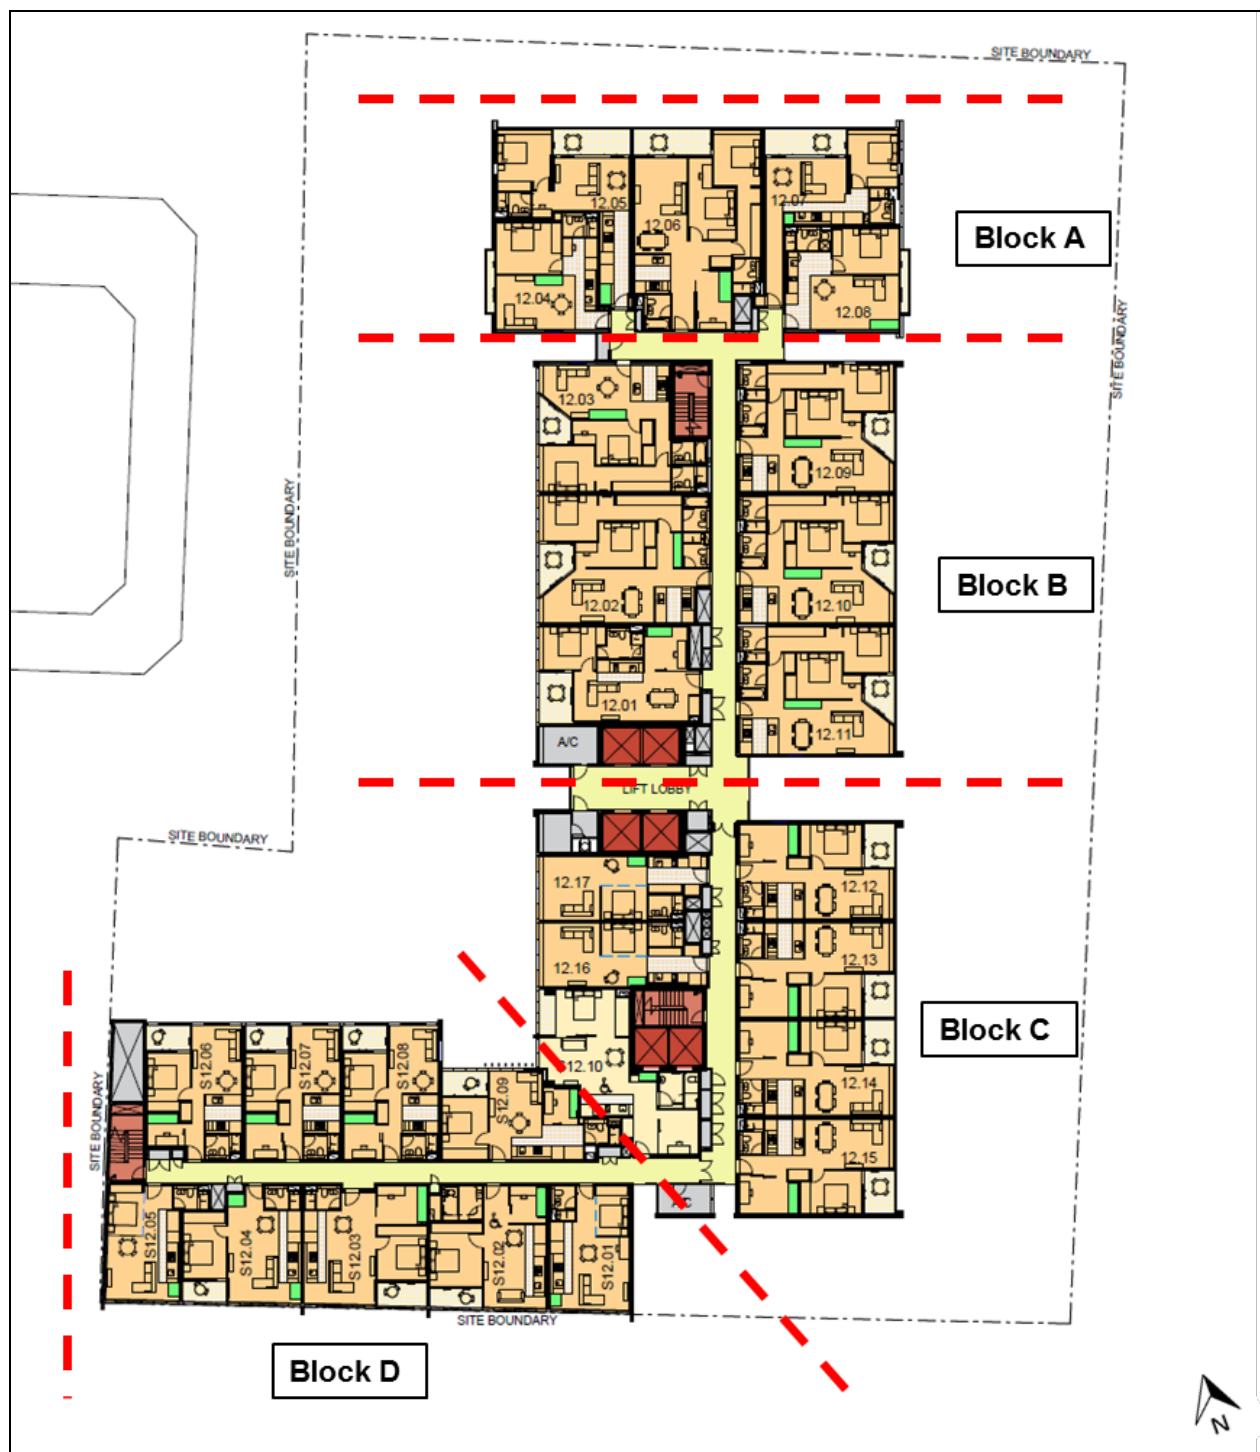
Proposed typical layout of the four blocks that make up the development (Base source: proponent's RtS)
